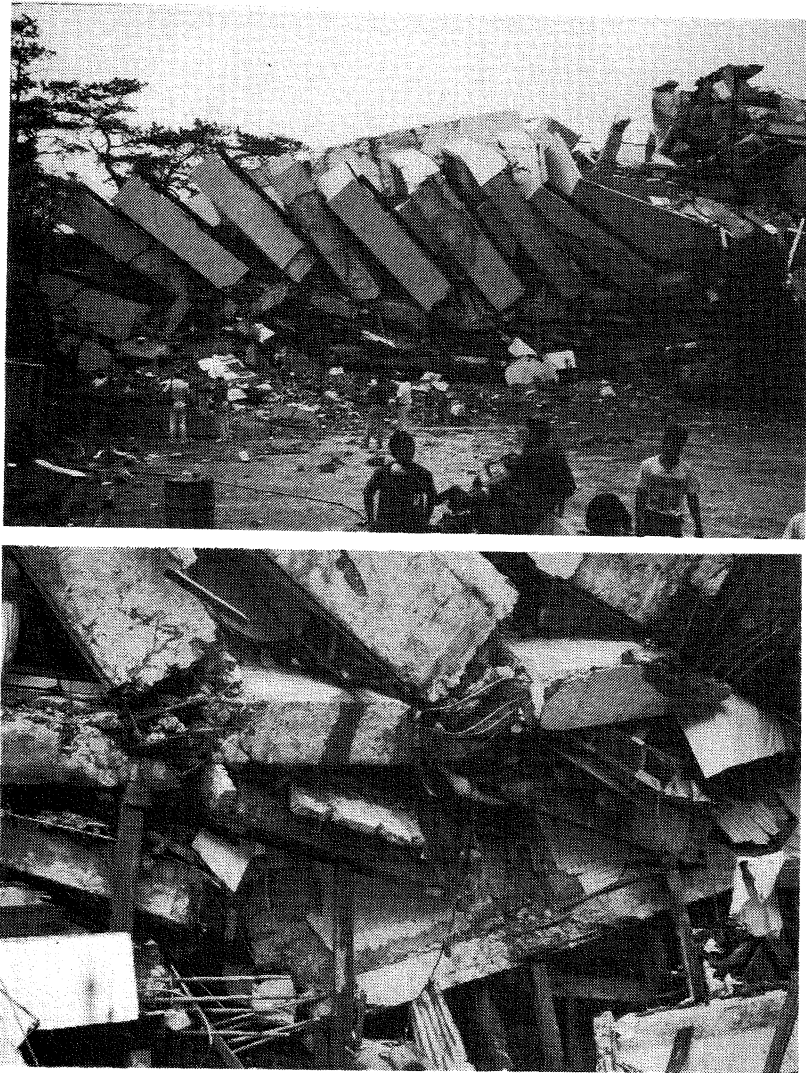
(top)* Tower block, Hyatt Terraces Hotel, Baguio. The heavy balcony elements have collapsed back on themselves during impact due to failure of the joint with the column (now lying horizontal)
